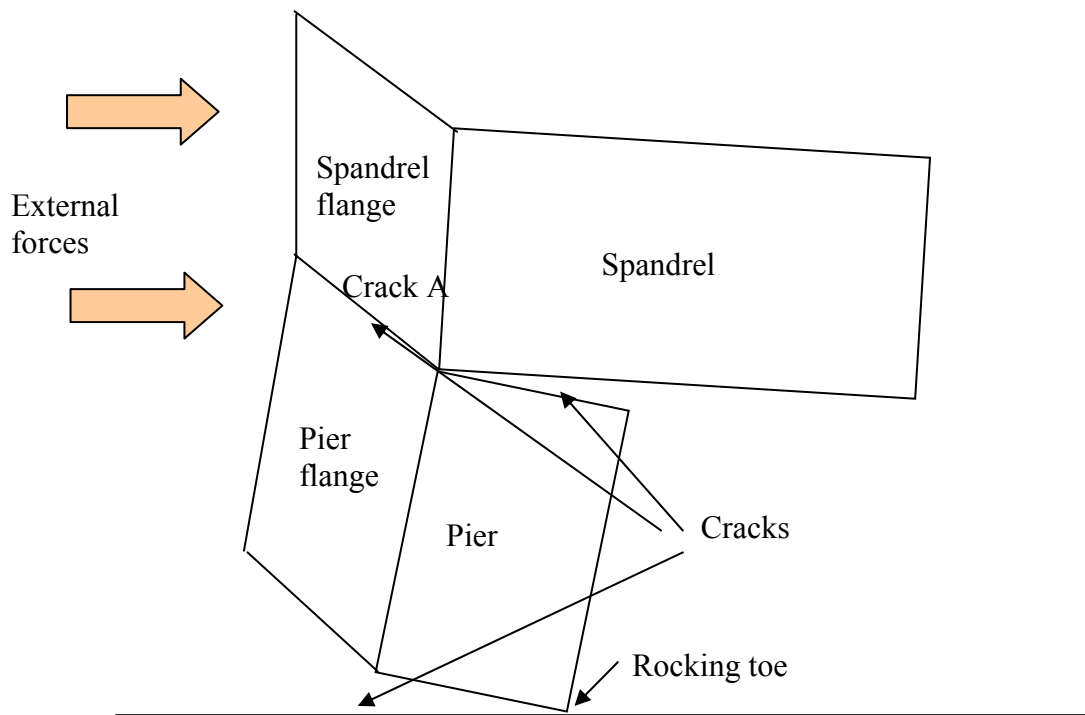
Pier flange and spandrel flange in the tensile side of a pier
